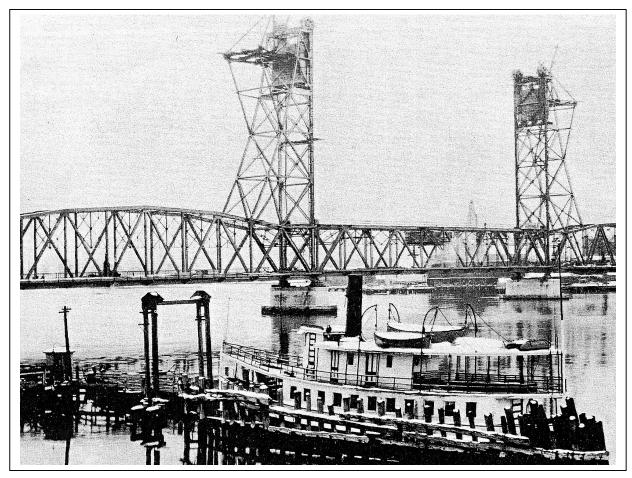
Lift Span in place before cables attached, derricks still in place (Dufresne 1961:16)
